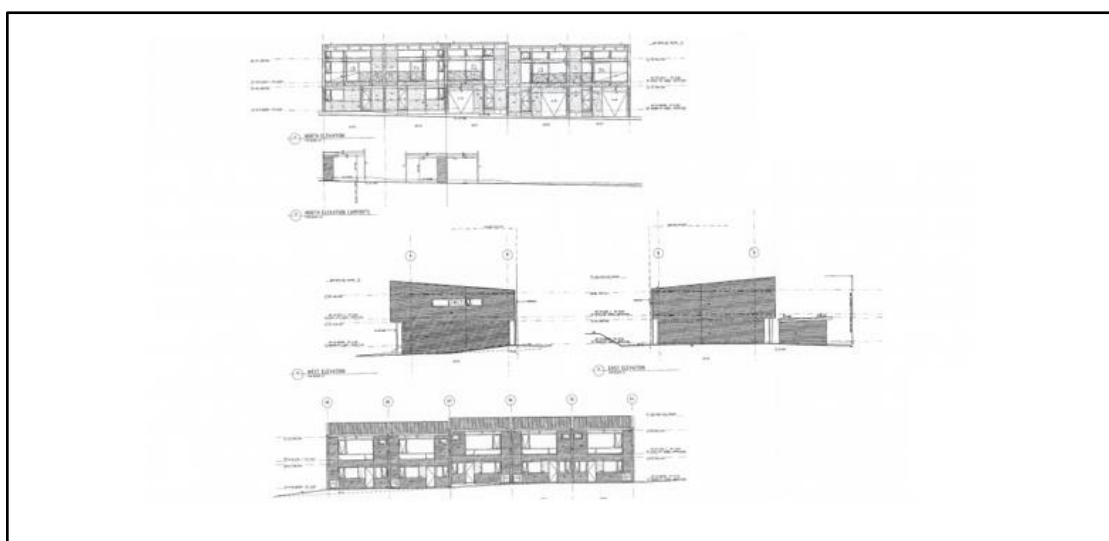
Elevations Block 3.2 - 1+2 Architecture
